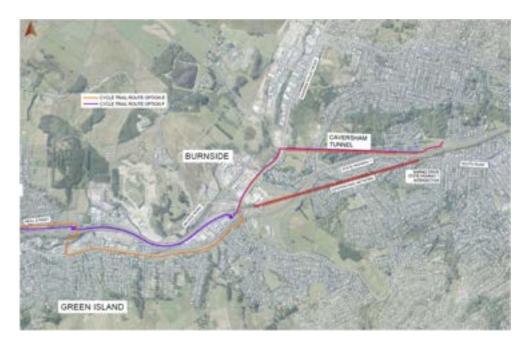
Section 3 of the Dunedin Tunnels Trail alignment – Harraway Road Underpass to Barnes Drive
